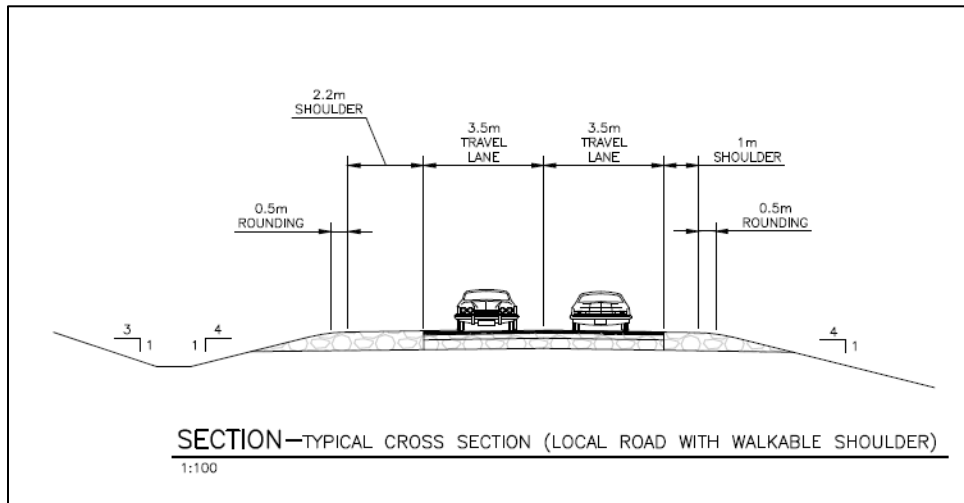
Typical cross sections for a local roadway with a walkable shoulder
